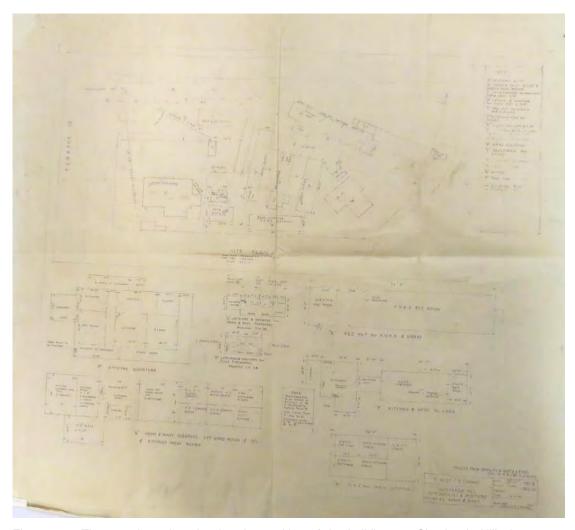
The complete plan showing the position of the buildings at Shepherds Hill plus new buildings to be erected. (Source: NAA, SP553/1, 125)
